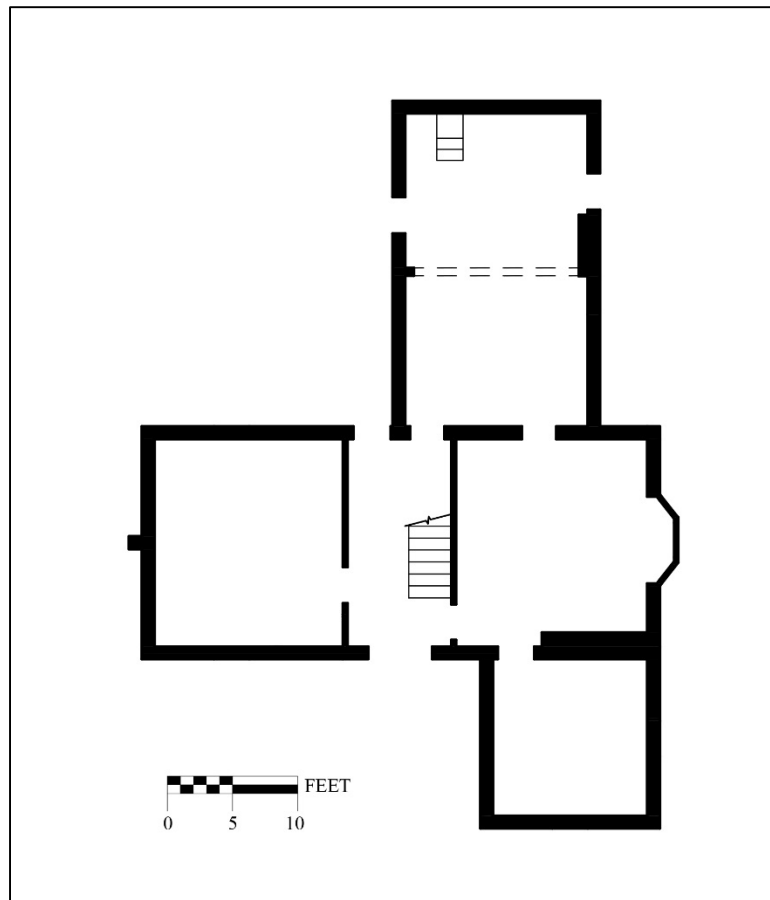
Grace Church Parsonage, first floor plan. Author, 2017.
